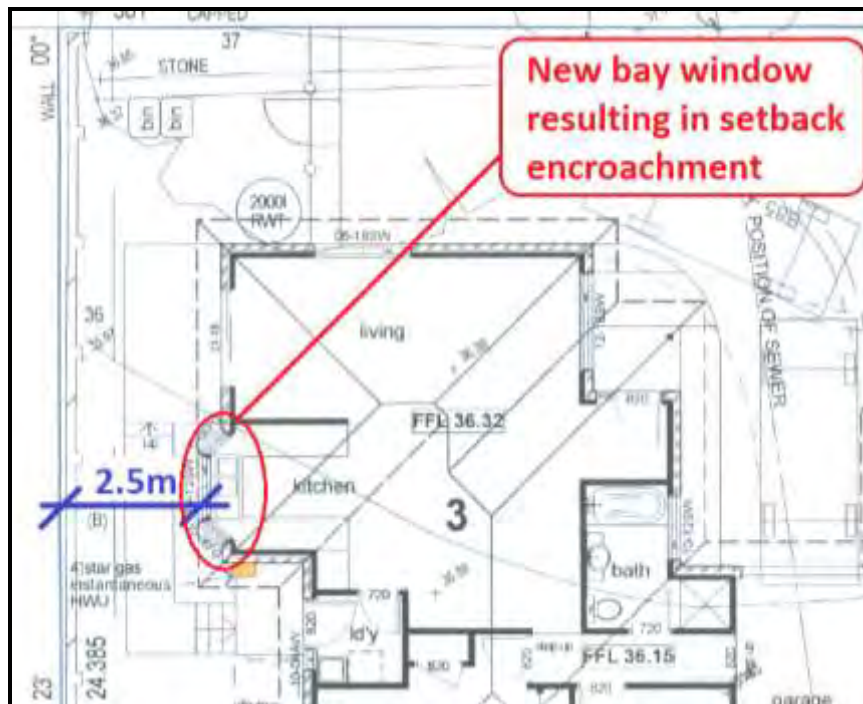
Unit 3 indicating the proposed bay window resulting in encroachment to the 3m side setback.
